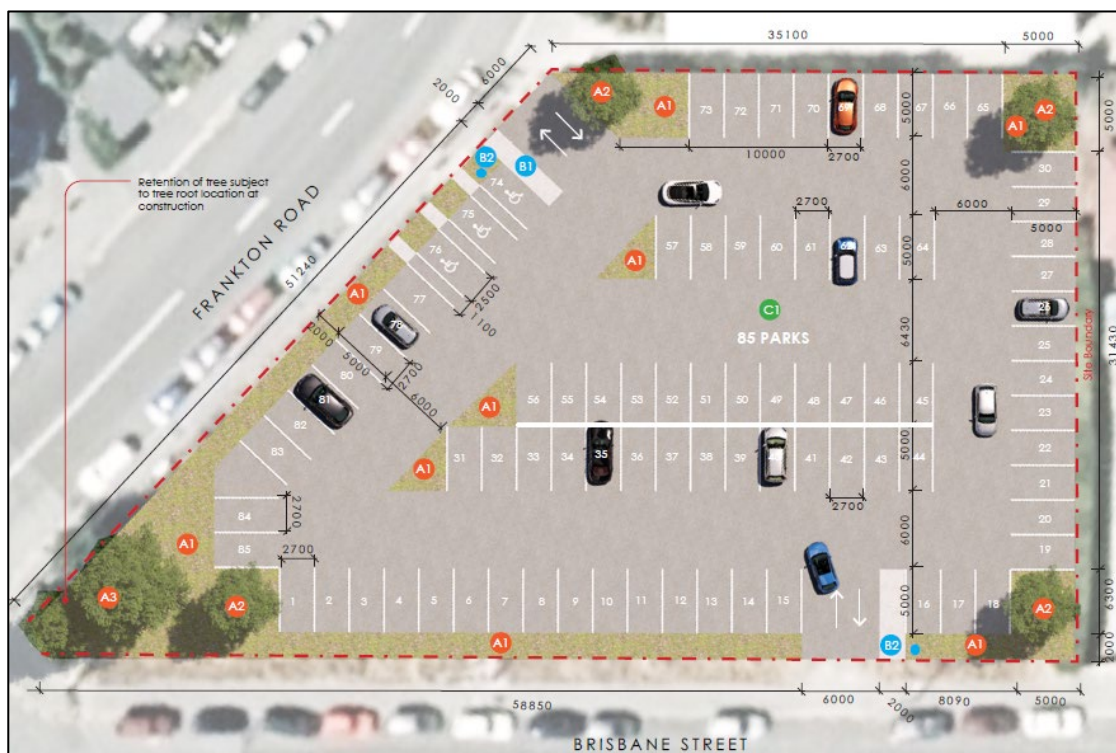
Site layout and landscaping plan (DCM Urban Design)
